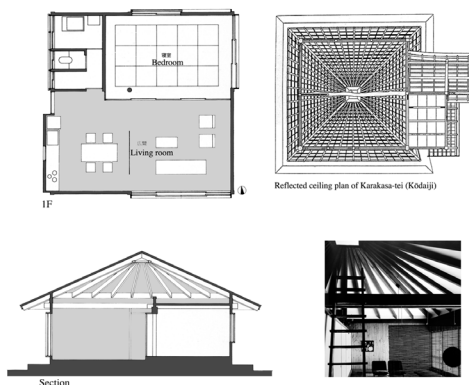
Shinohara Kazuo, Umbrella House, Tokyo, 1962. Plan, section, interior photograph (©Murai Osamu 村井修), adapted by the author from Shinohara 1996.
